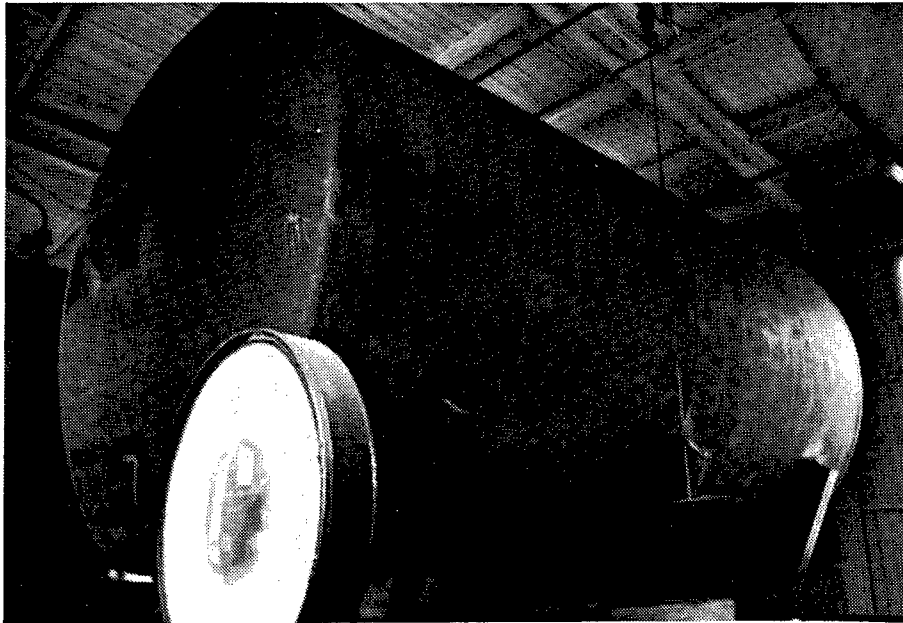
Building 302: Tank located in Tank Room on the second floor.
